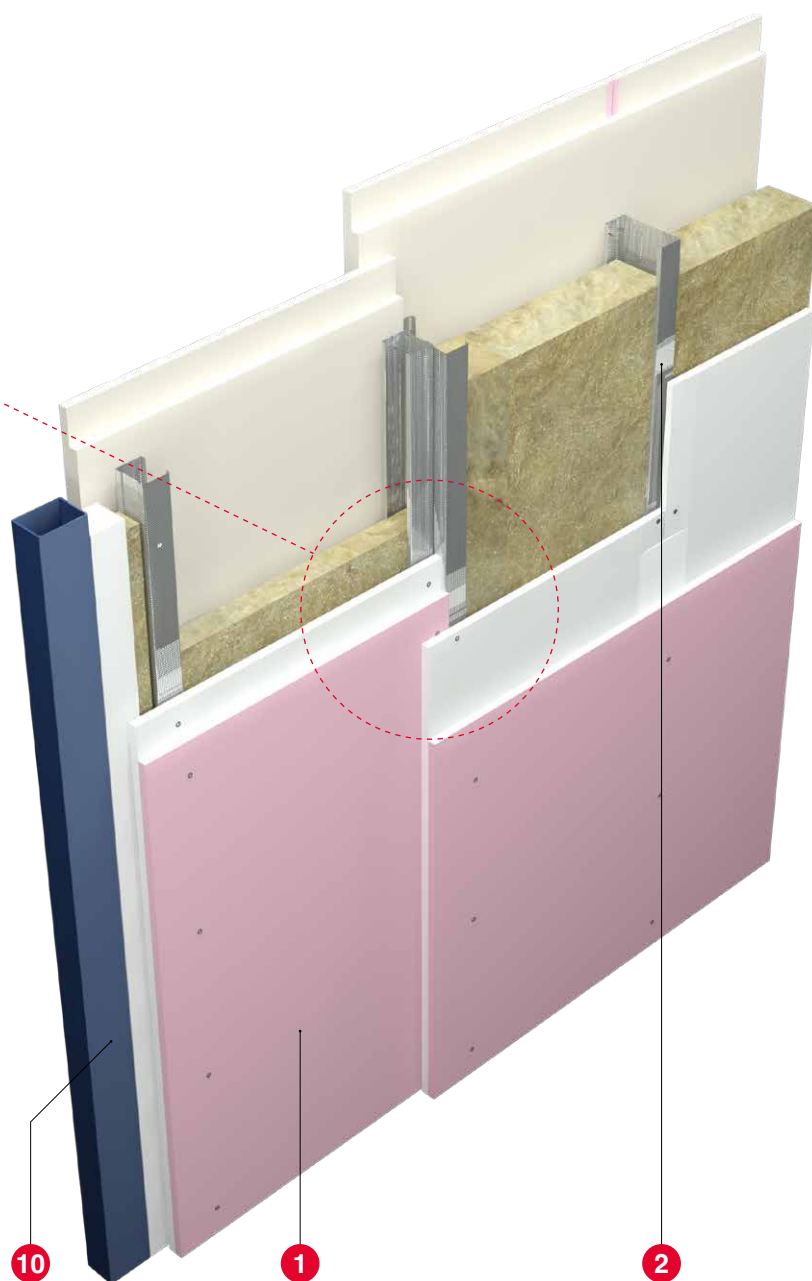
Reduction joint connecting a partition wall with the wall structure
